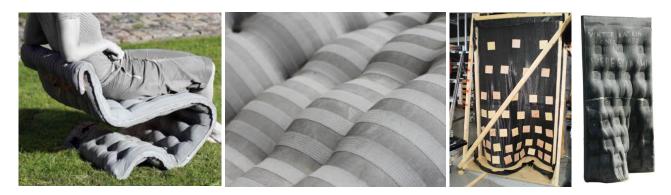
Left: Ambiguous chair, made by tensioning textiles in a rectangular frame. Centre: Close-up showing the pattern created on the concrete by the tensioned textile formwork. Source: (Manelius, 2012, p. 185 and 186). Wooden frame, clamps and textile formwork used to make the wall. Centre: Clamp wall made by combining textile and clamps, which leave the rectangular shapes on the final construction. Source: (Manelius, 2012, p. 150 and 149).
